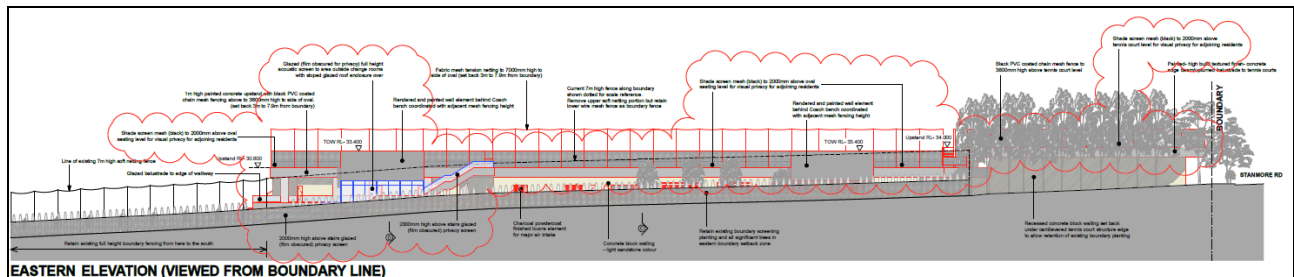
Eastern elevation of proposed Old Boy's Sporting Complex
